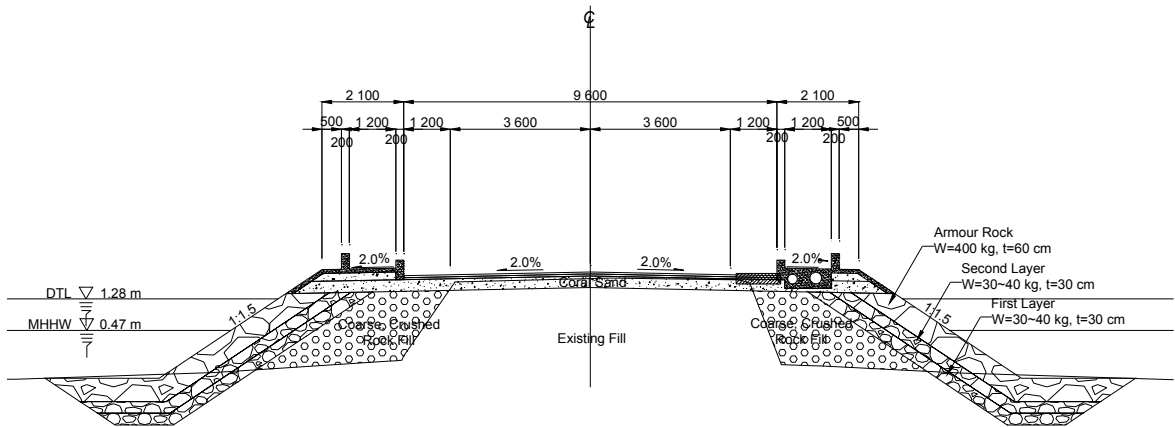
Meyungs Causeway Typical Cross Section.
